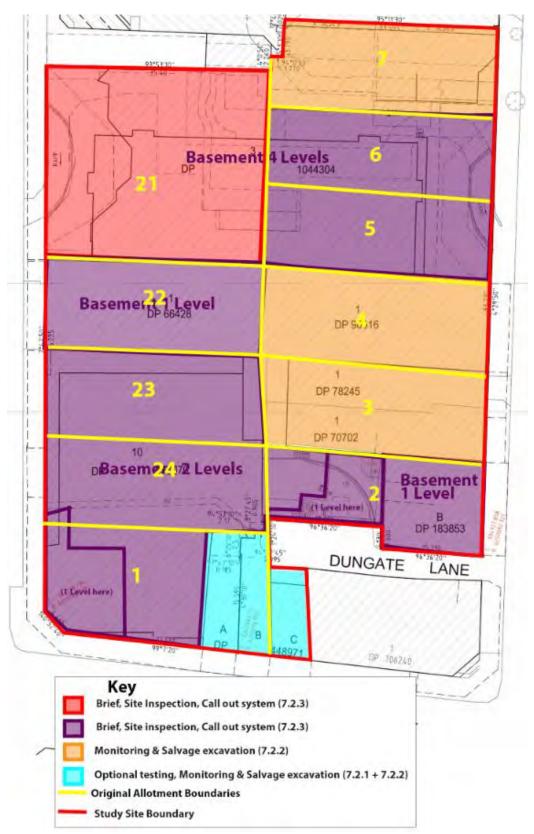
Diagram showing the study site divided per site-specific excavation methodology.
